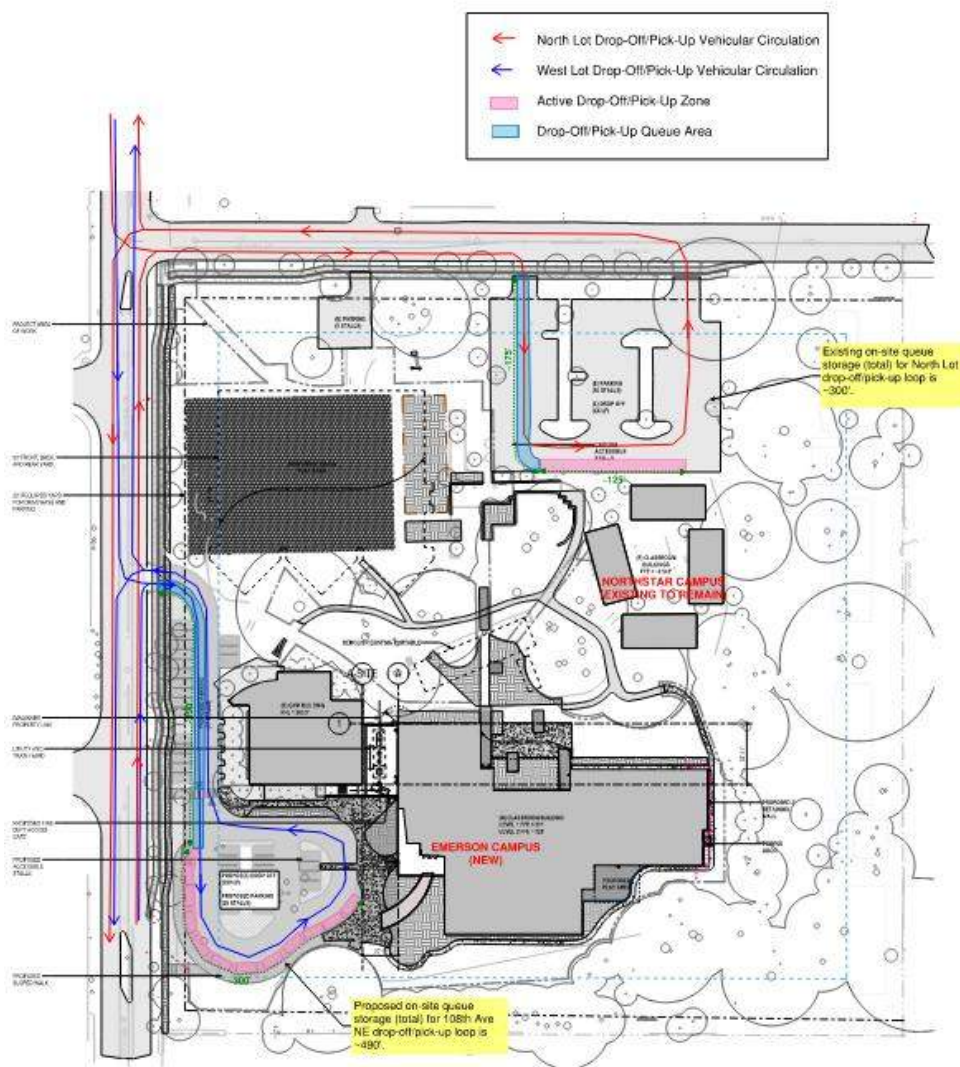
Preliminary Site Plan (source: Kimley-Horn)
